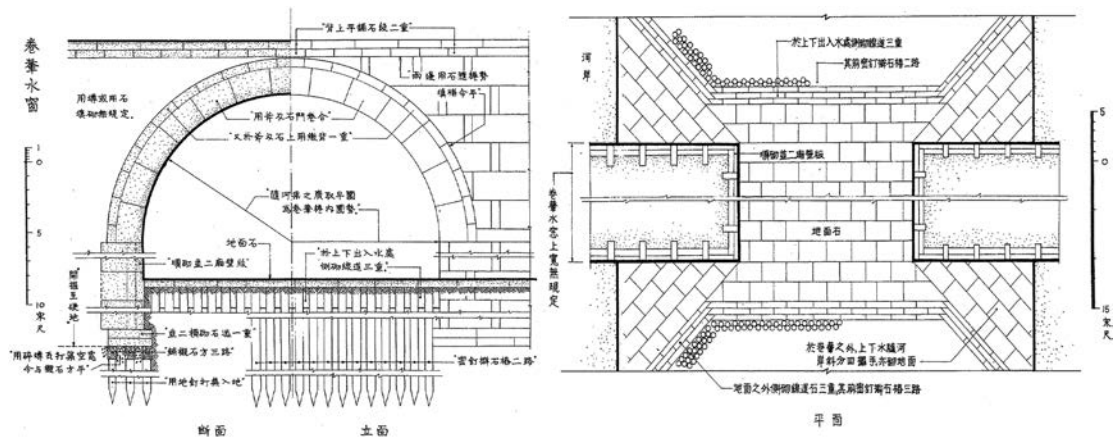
Cross and plan section of arched water gate according to "Yingzao fashi" by Li Jie, Song Dynasty, 1103 (Liang Sicheng, 1983)
